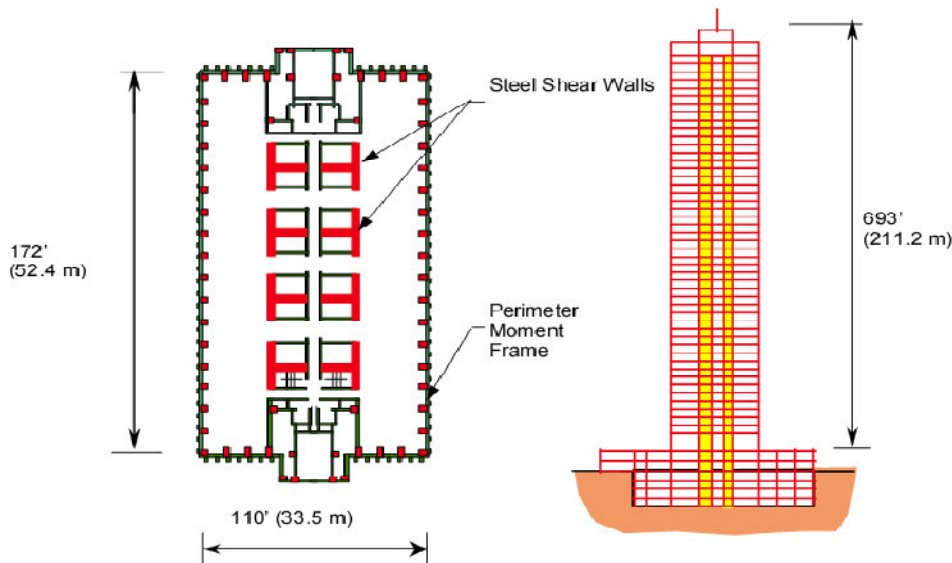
Details of steel shear walls used in Nippon Steel Building
